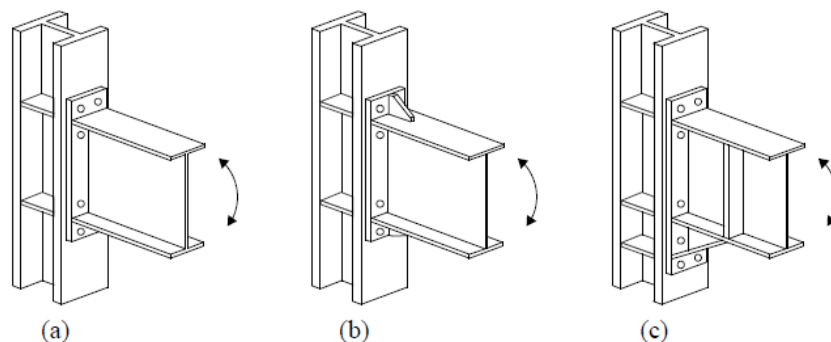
Bolted beam-to-column joint configurations investigated in the framework of the EQUALJOINTS RFCS project
